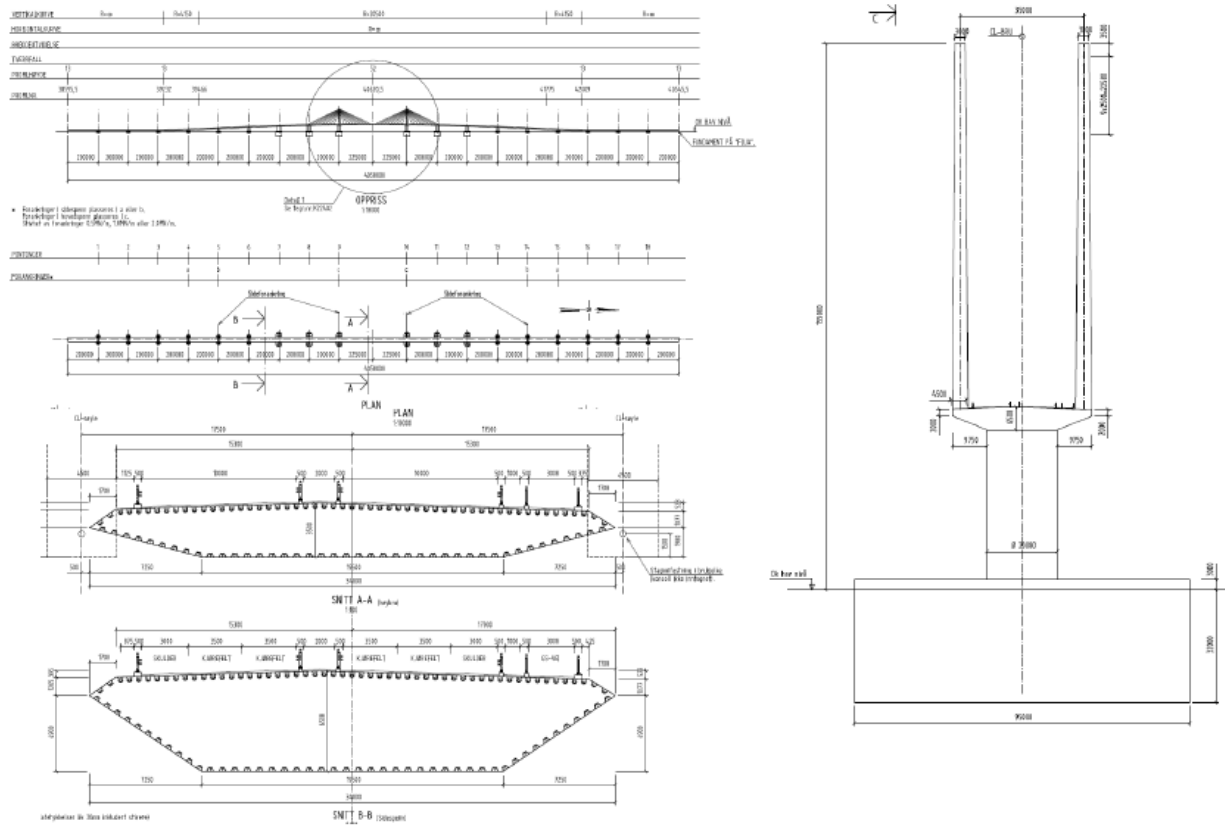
Illustration of the "Strait bridge" alternative (one bridge girder and one footway/bicycle track) (Pederese, Innebern and Andersen).
